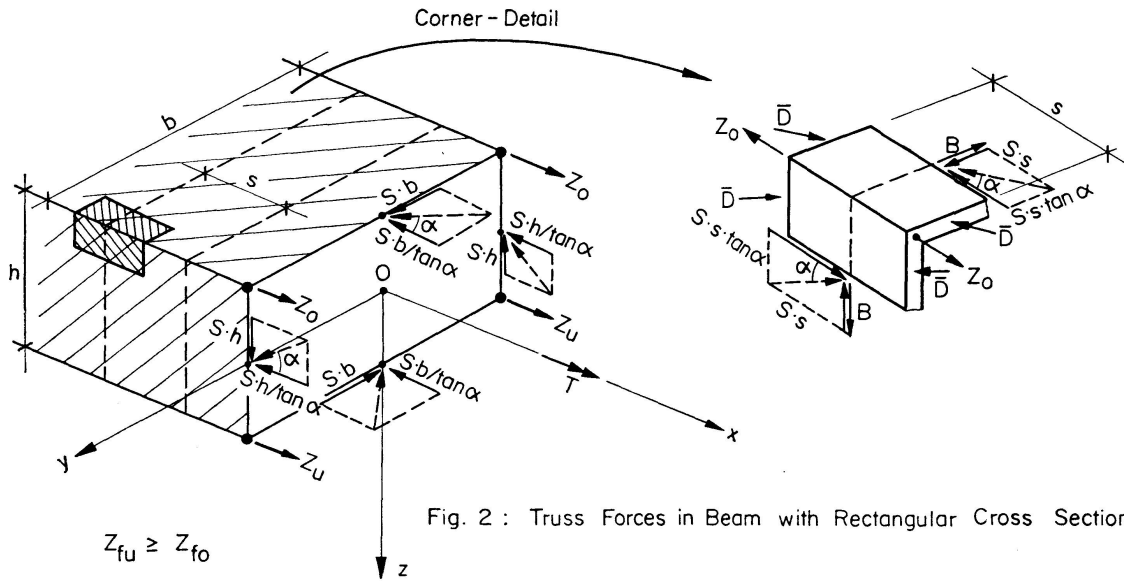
Truss Forces in Beam with Rectangular Cross Section
